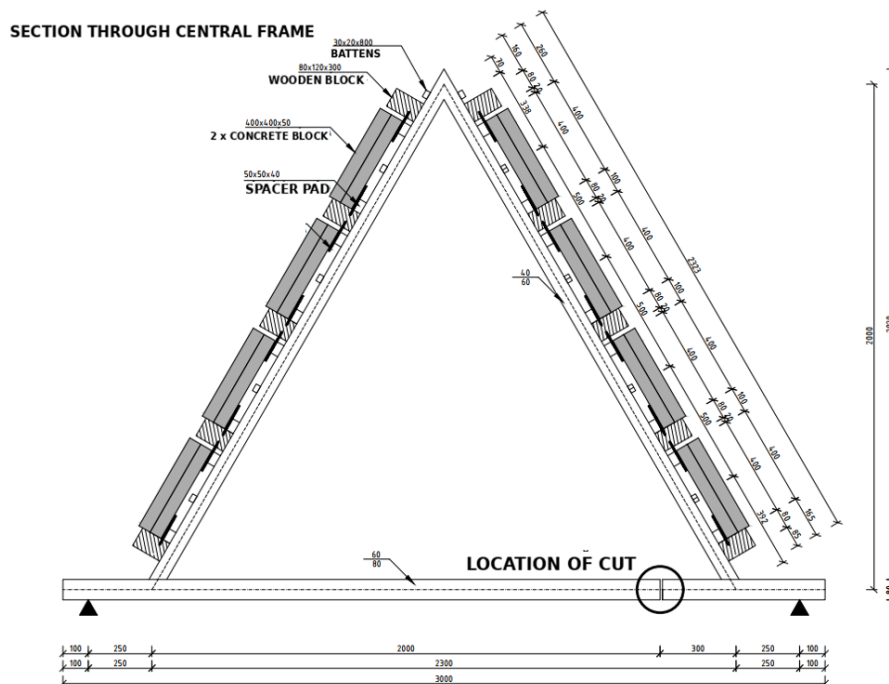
Section through the central transverse frame — element dimensions in mm, lathing, wooden spacer blocks, concrete-block ballast (applied load) and the location of the tie-beam cut.
